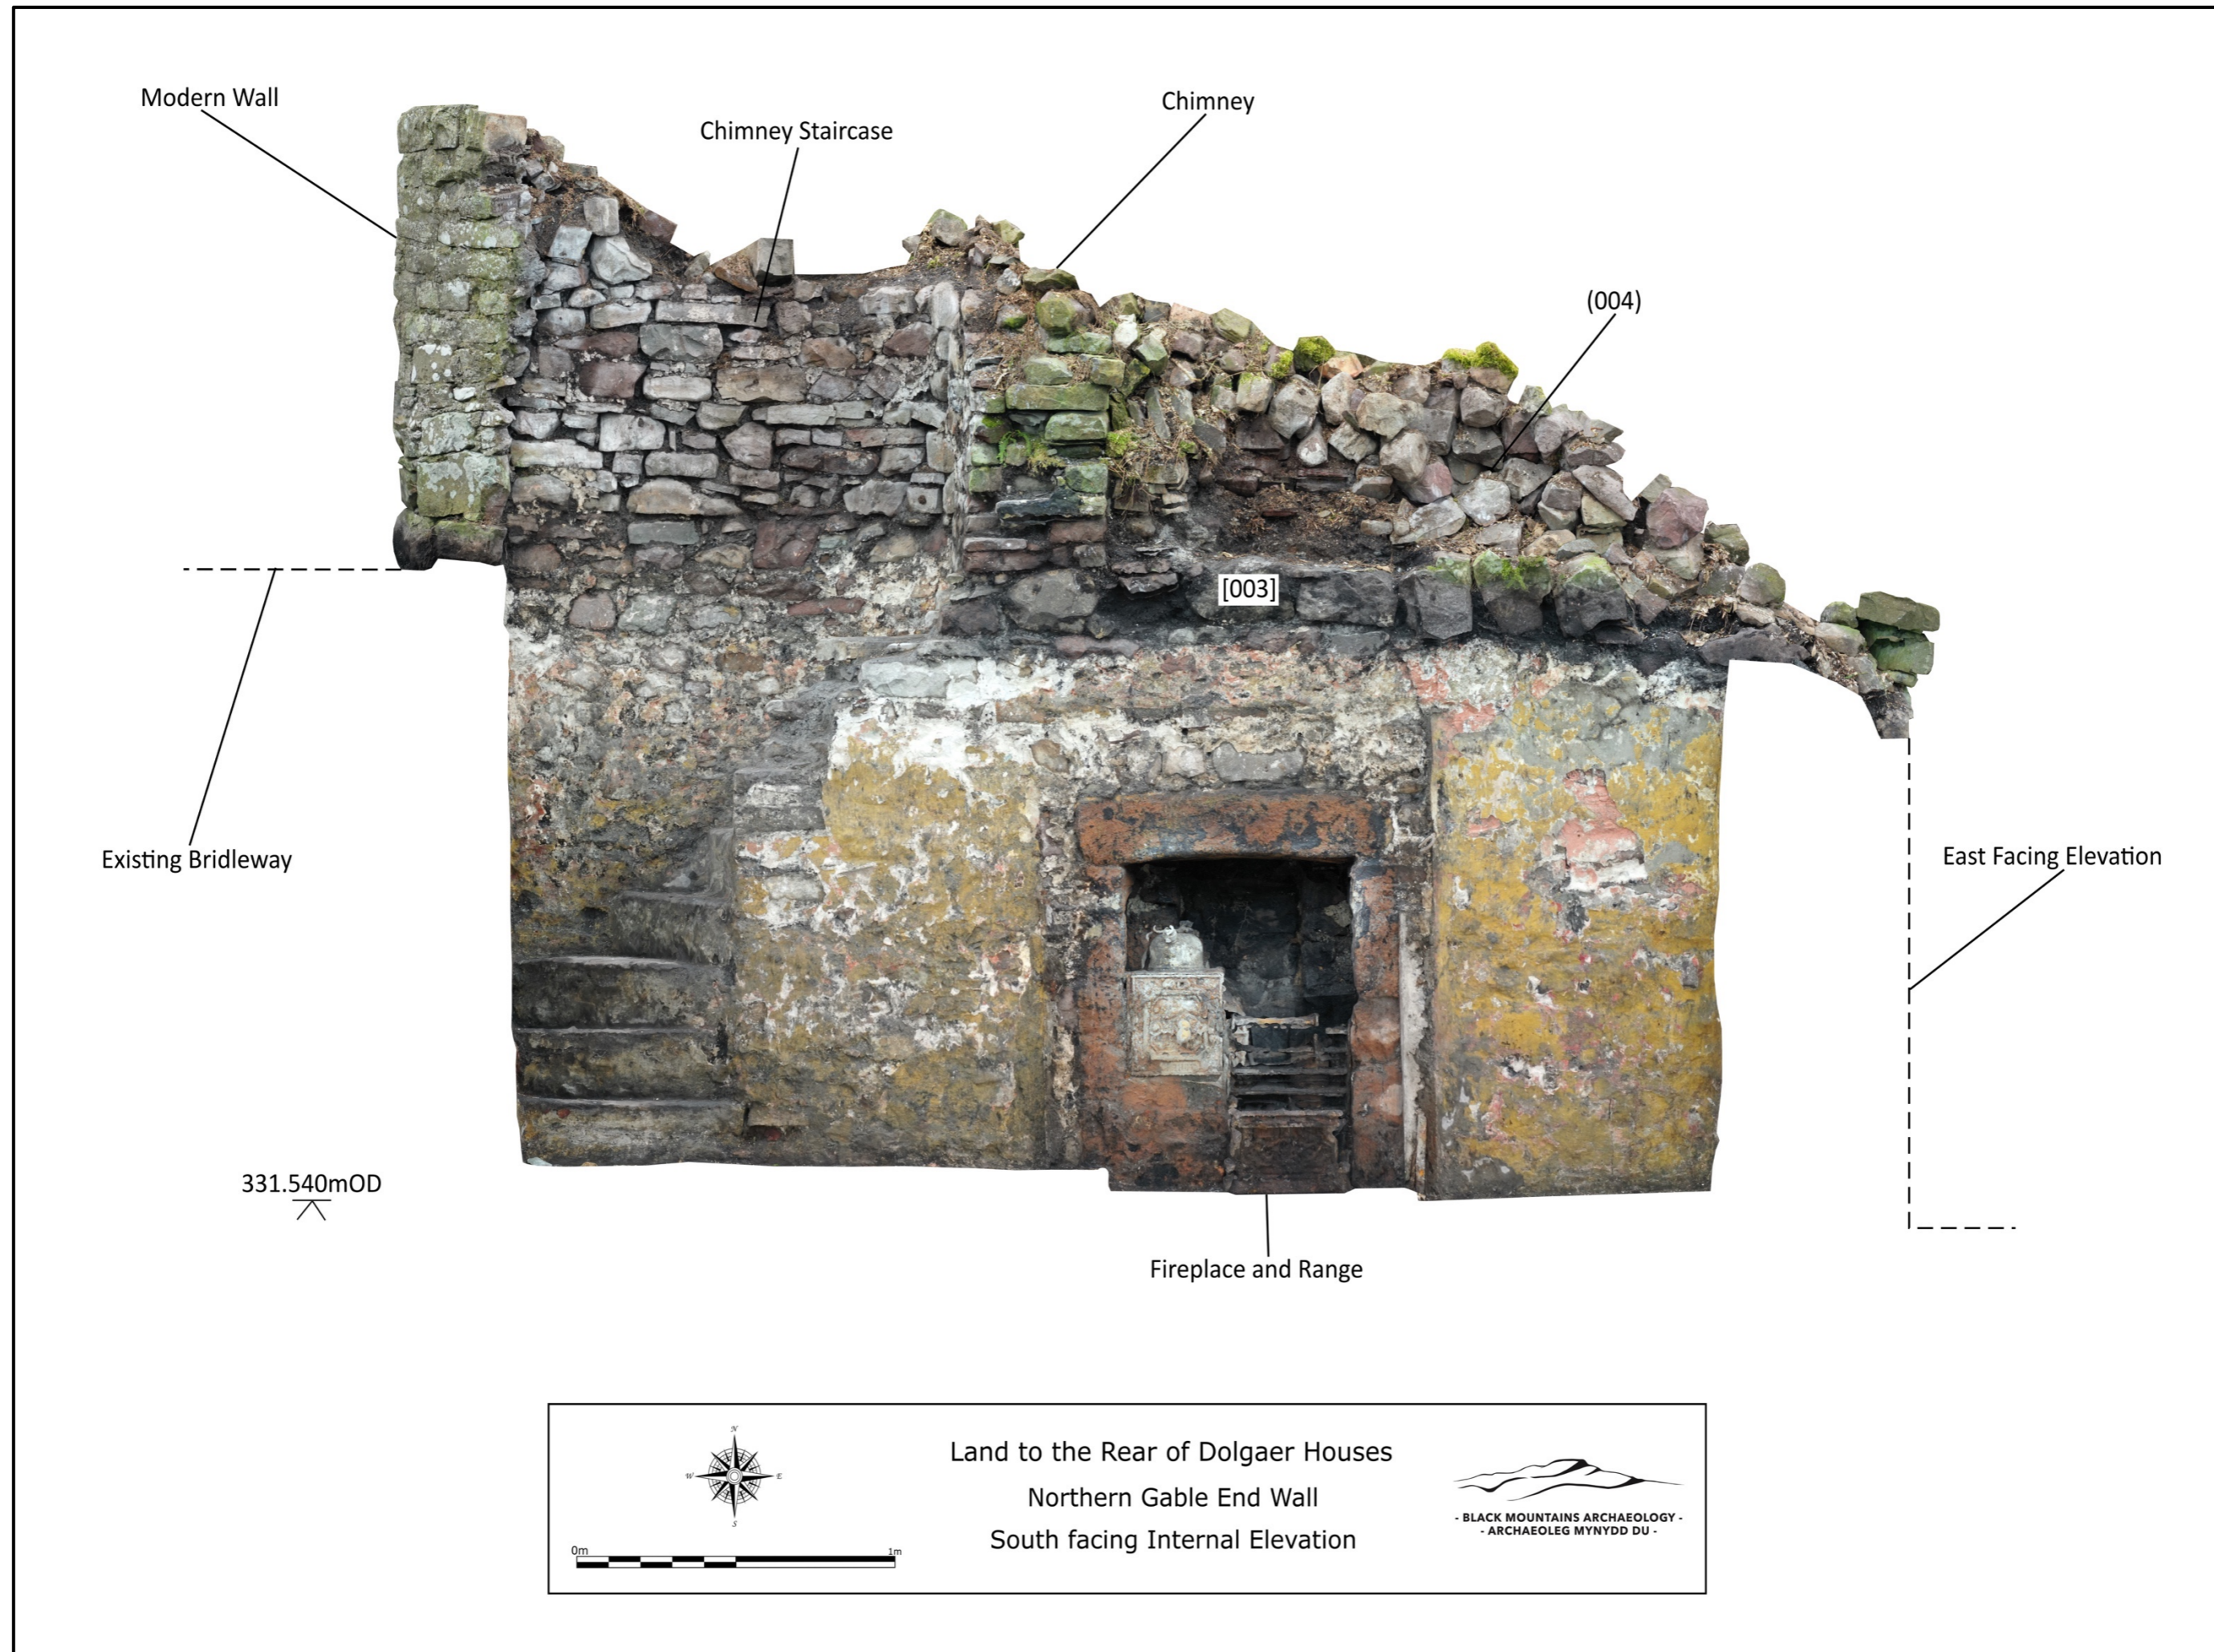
Photogrammetric still of south-facing section of northern gable end wall.
